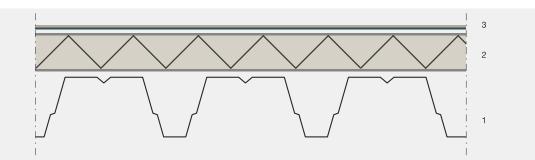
Roof build-up - Thermal design | 1-Steel deck | 2-PIR insulation | 3-TPO membrane
